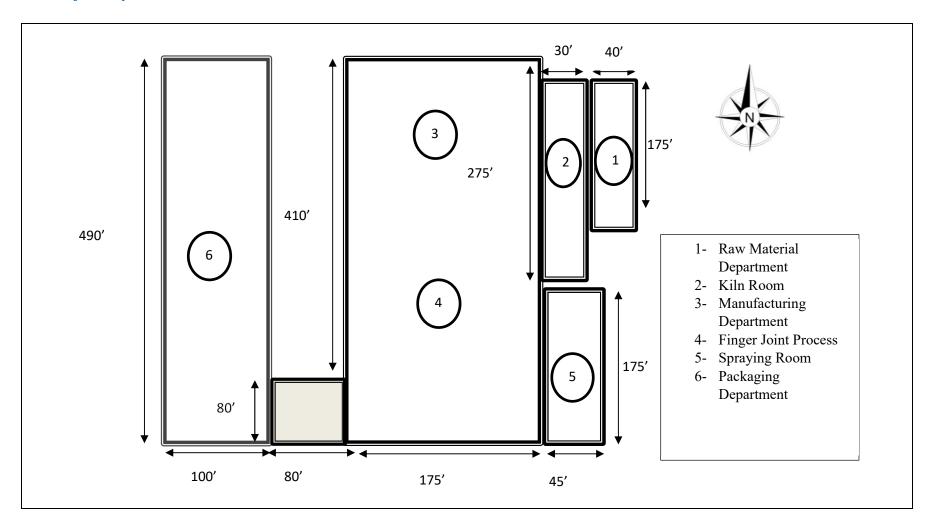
Layout Plan of Proposed Valued Added Wood Factory
